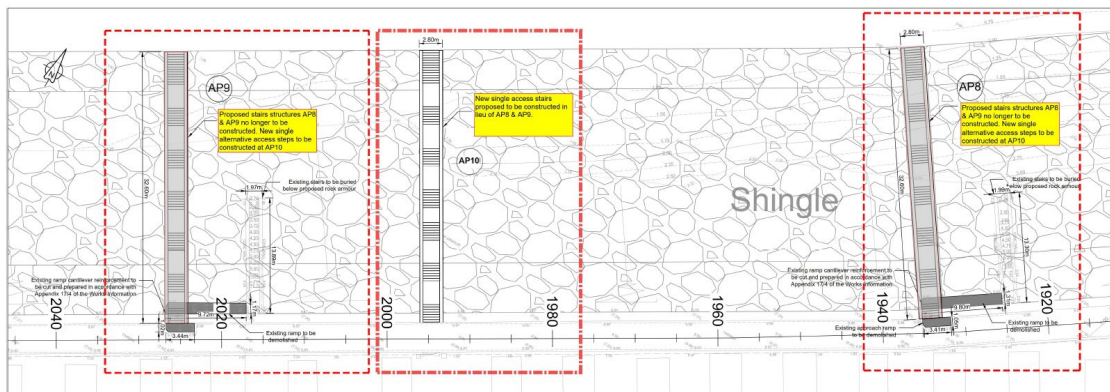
Drawing showing the original layout of the proposed beach access steps (AP8 (right), AP9 (left)) and the new proposed single beach access steps (AP10 center)
